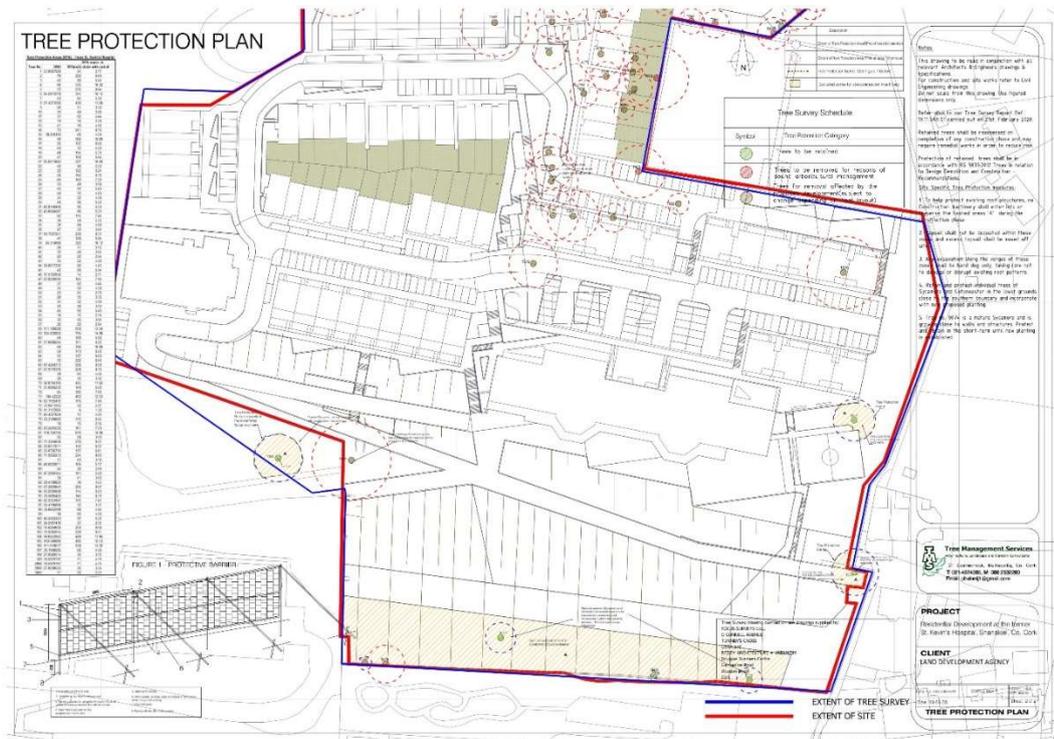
Tree protection plan (southern) showing trees to be removed (red) and trees to be retained (green).
